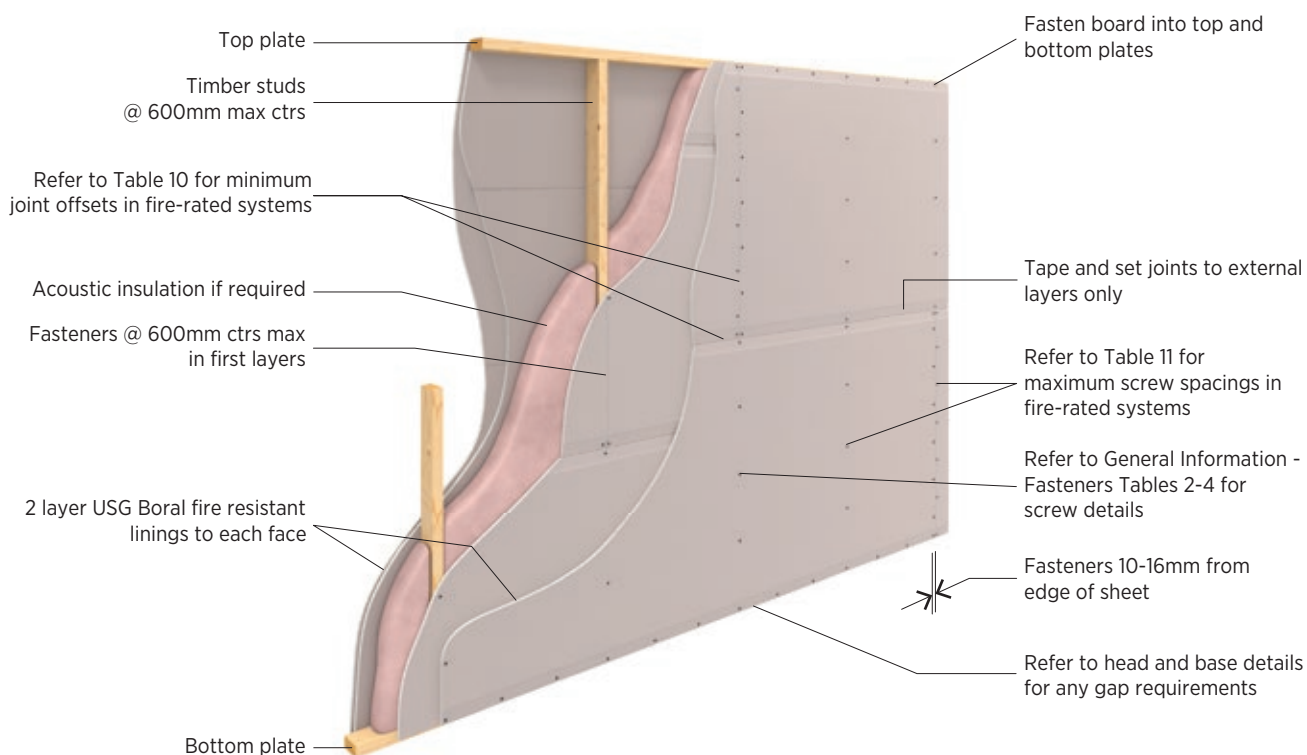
Fire-rated Timber Stud – Horizontal Fixing – Multiple Layer
